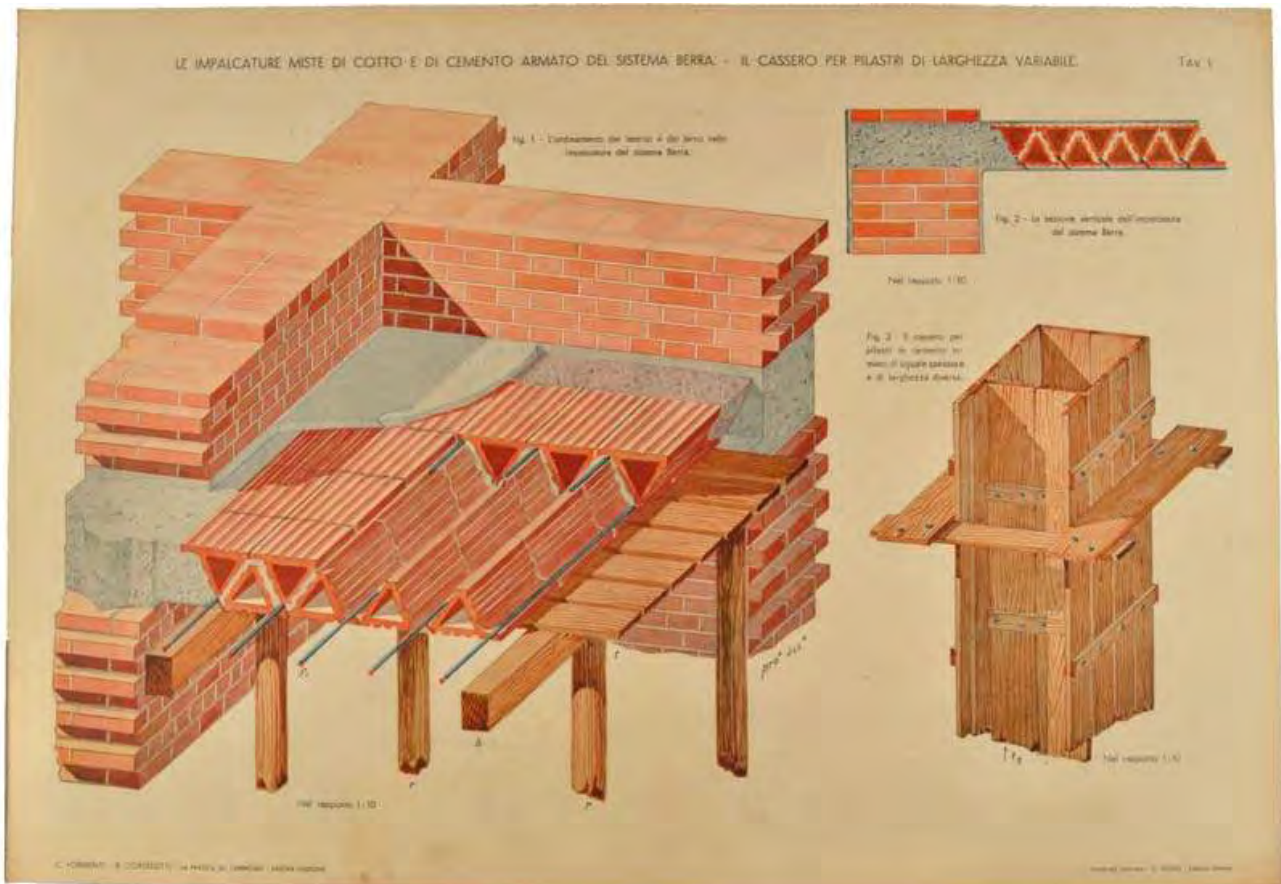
Formenti's: scaffold of bricks mixed to concrete and reinforced Berra system. Formwork for pillars of variable width.
